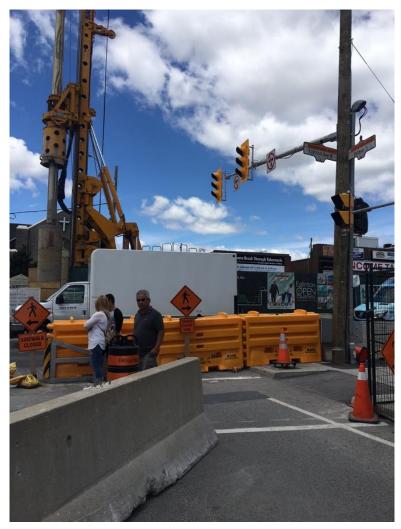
Dufferin and Eglinton during construction of the Crosstown. *Photo by the author.
